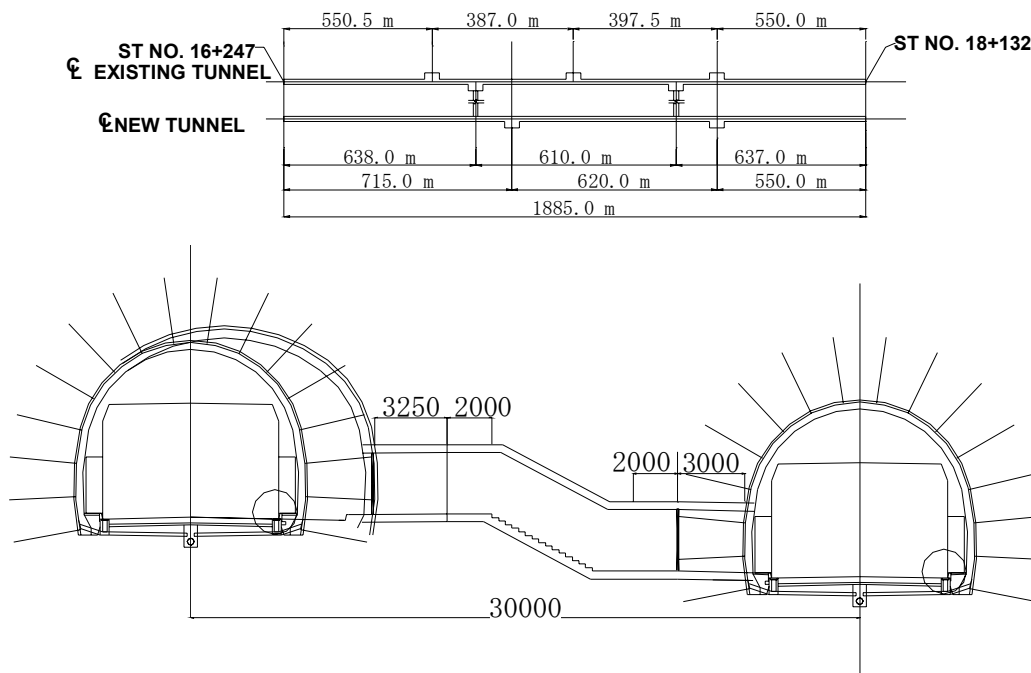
Cross Passage (Evacuation Tunnel) between the 1st and 2nd Kohat Tunnels
